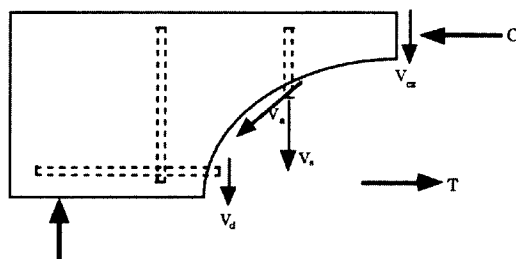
Internal shear forces carried by concrete and shear reinforcement
